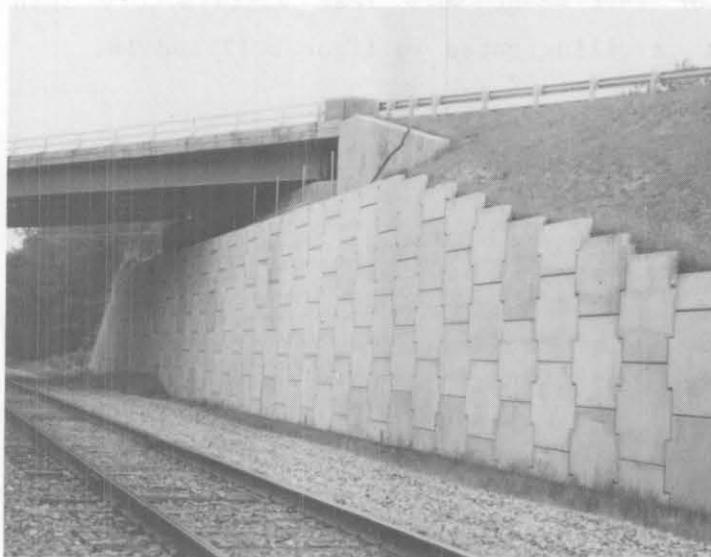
Reinforced earth supported embankment that serves as foundation for abutments of railroad bridge at Wells, Maine.
